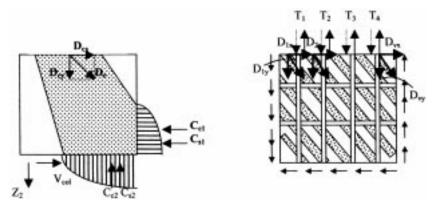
Forces acting in the joint concrete core from the strut and truss mechanism (Tsonos 1997)
